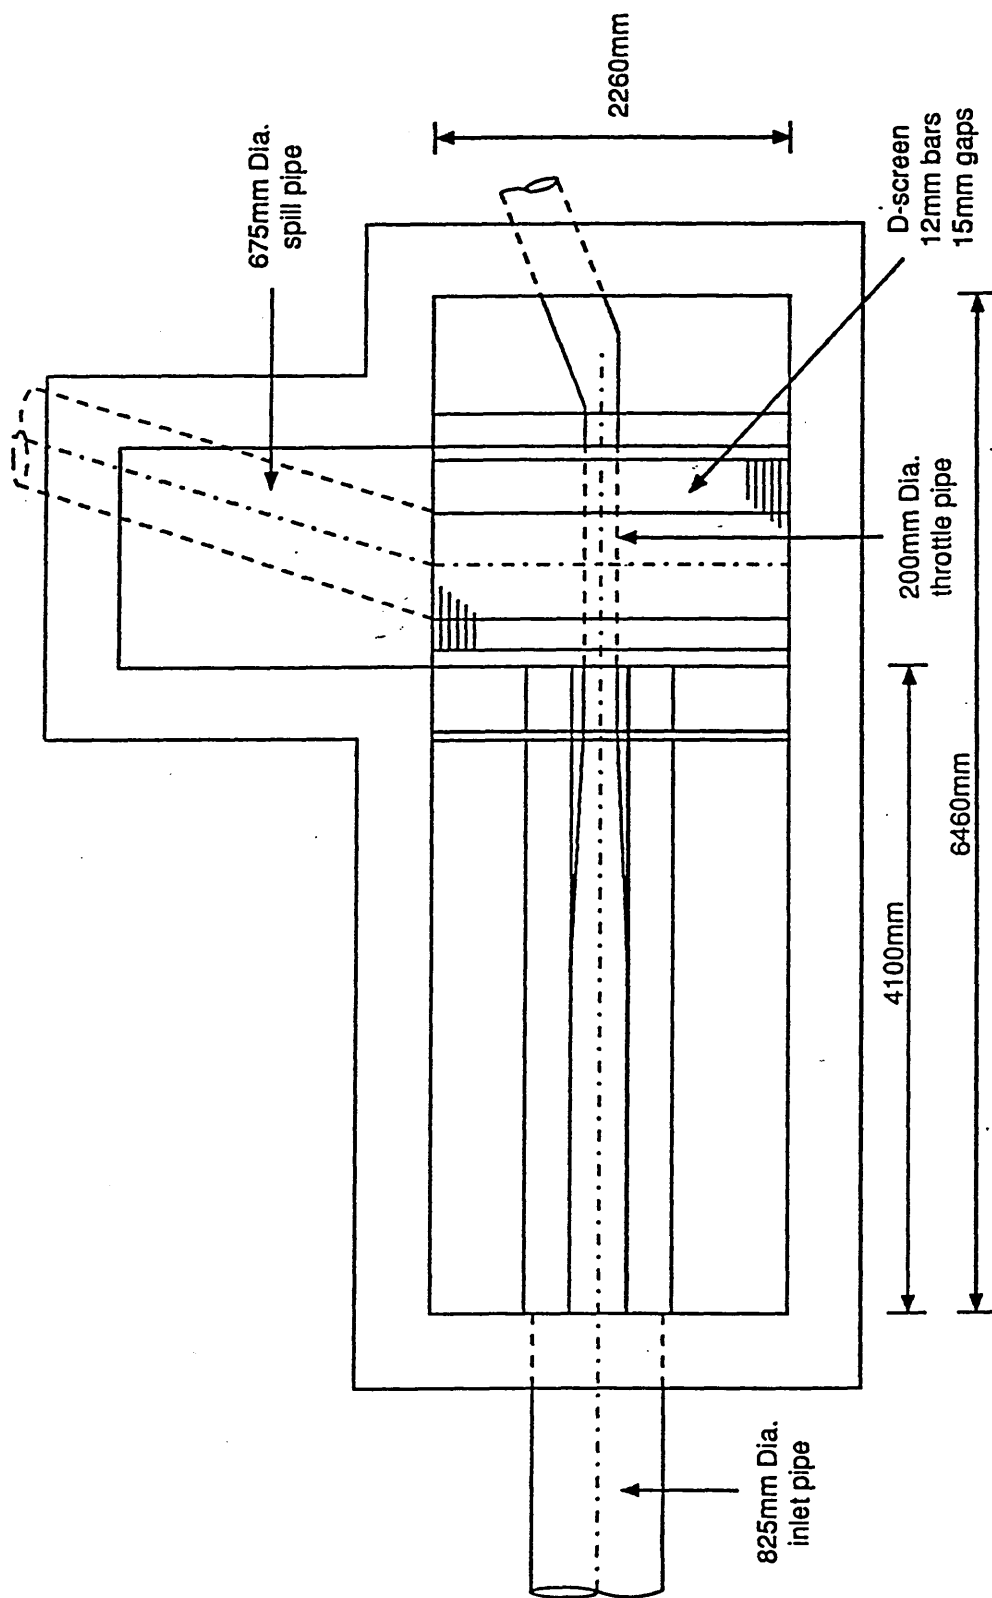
Plan of Sharpe & Kirkbride Stilling Pond CSO
